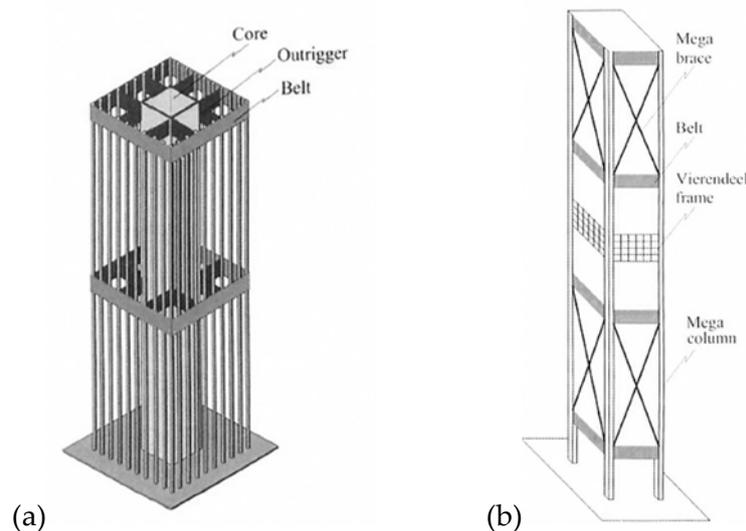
Outrigger system (a) and mega structure (b)<sup>69</sup>
